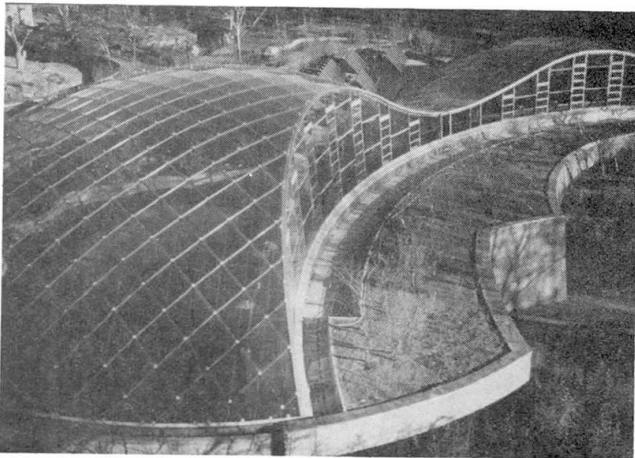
Lightweight Roof structures for the Outdoor Stadium Kuala Lumpur, Malaysia.
